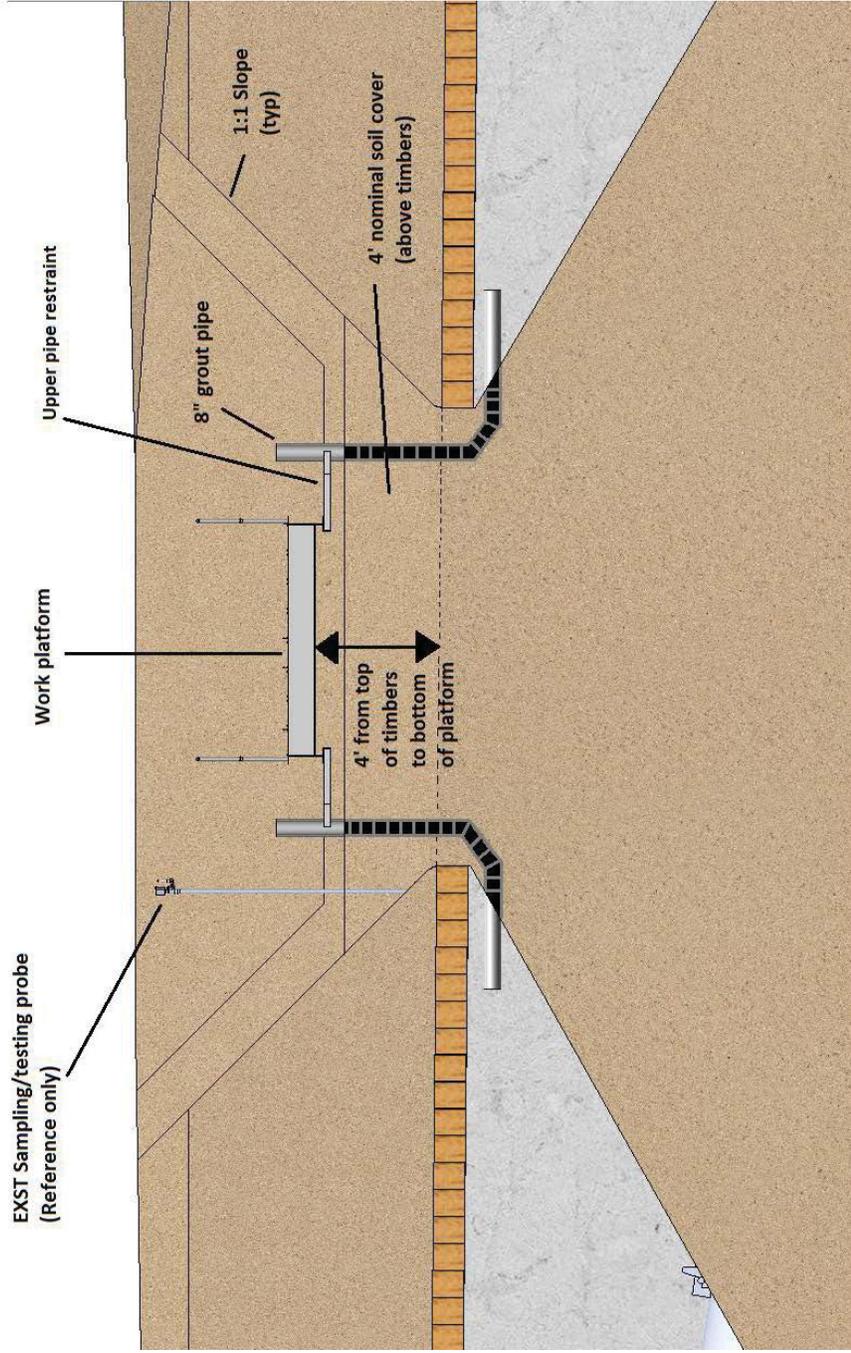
West Elevation of Tunnel Number 1 Grouting Equipment – Platform and Piping
